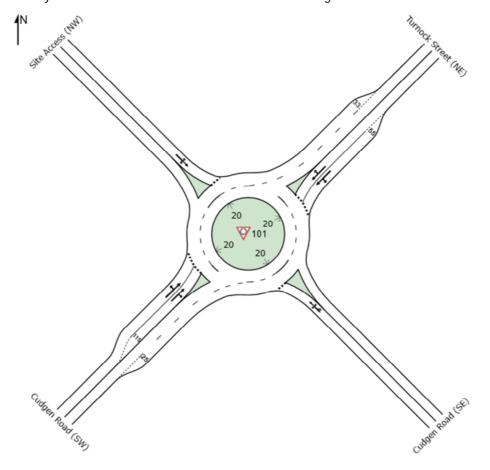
Cudgen Road / Turnock Street SIDRA Intersection Layout (With Access)
